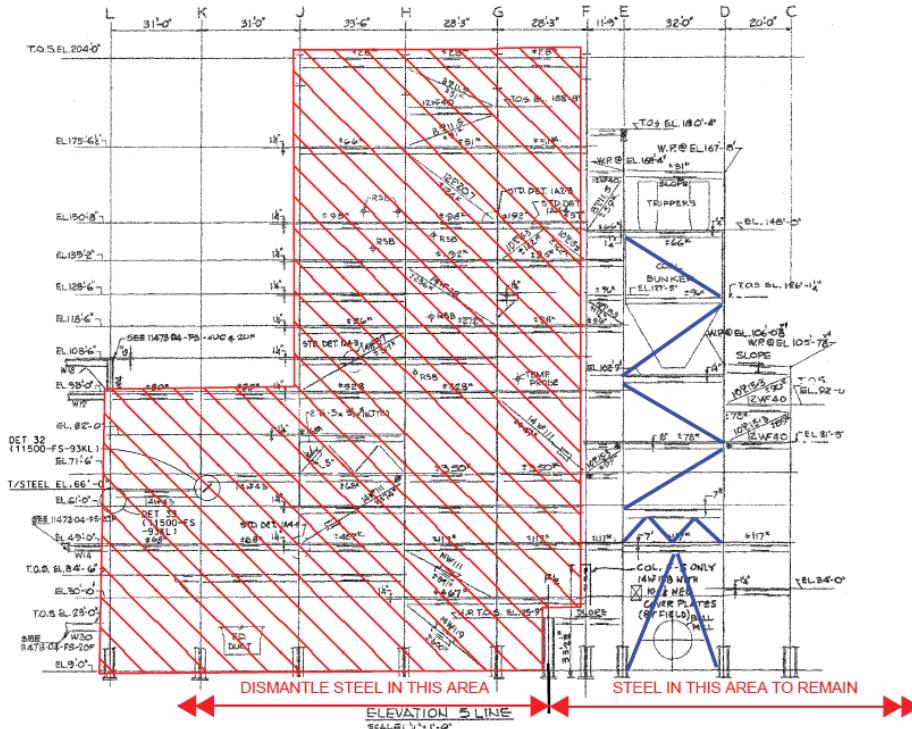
New Vertical Bracing and Boiler Steel Demolition
